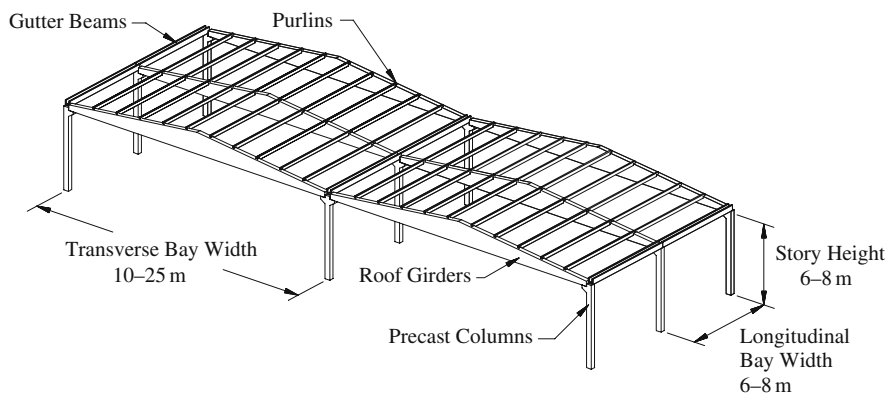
Typical geometry of one-story precast industrial buildings
